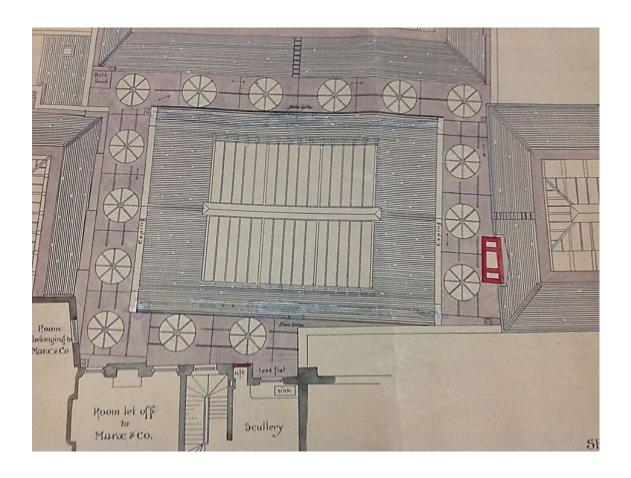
EDWARD R. ROBSON, ROOF PLAN, NEW GALLERY, 1888. NATIONAL ARCHIVES.
